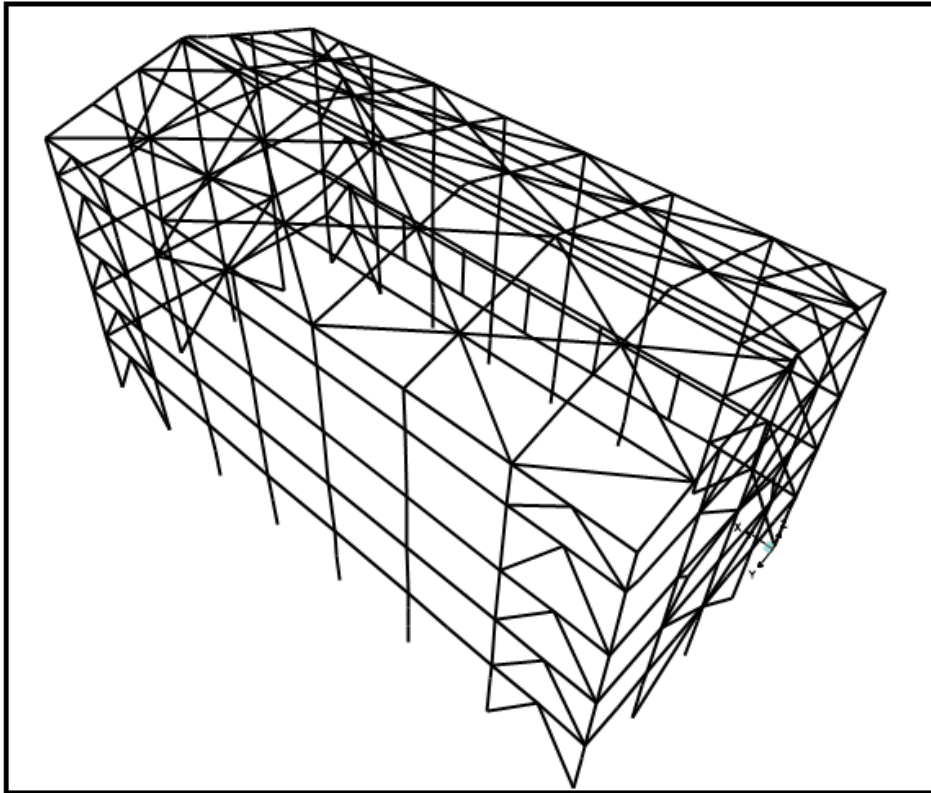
General Layout of Out-of-plane Braced Portal Frame Structural System.
